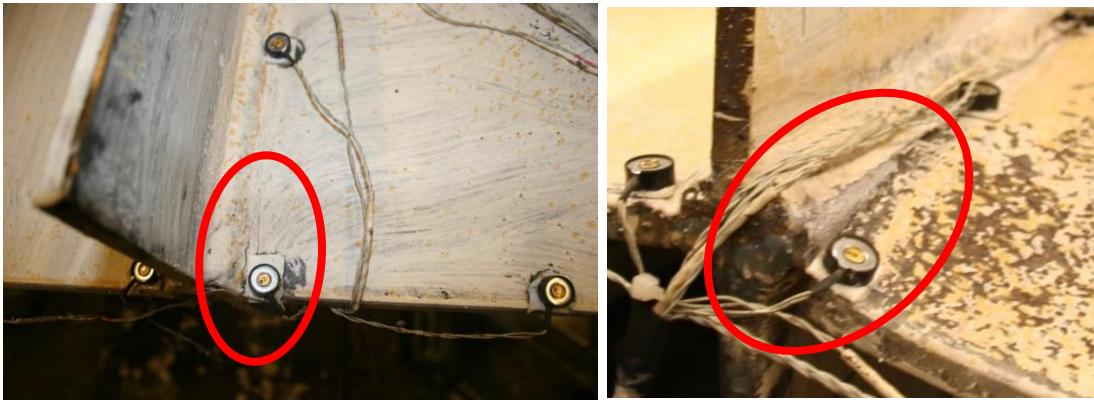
Location of observed plate cracking (gusset plate and stiffener)
